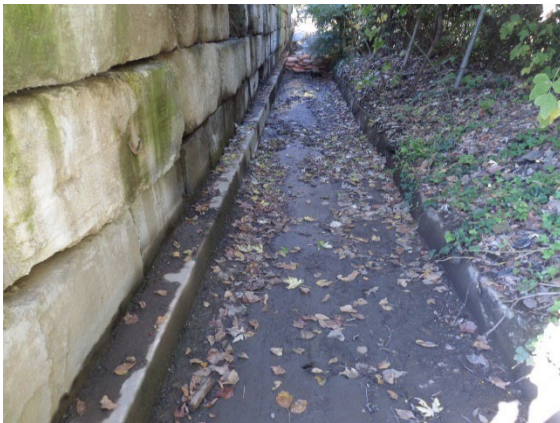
HTL. Bunkers. Observed concrete culvert was wet behind Bunkers 11:22 am. View Northwest.
